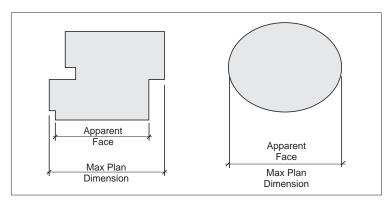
MAX. PLAN DIMENSION AND MAX. APPARENT FACE
